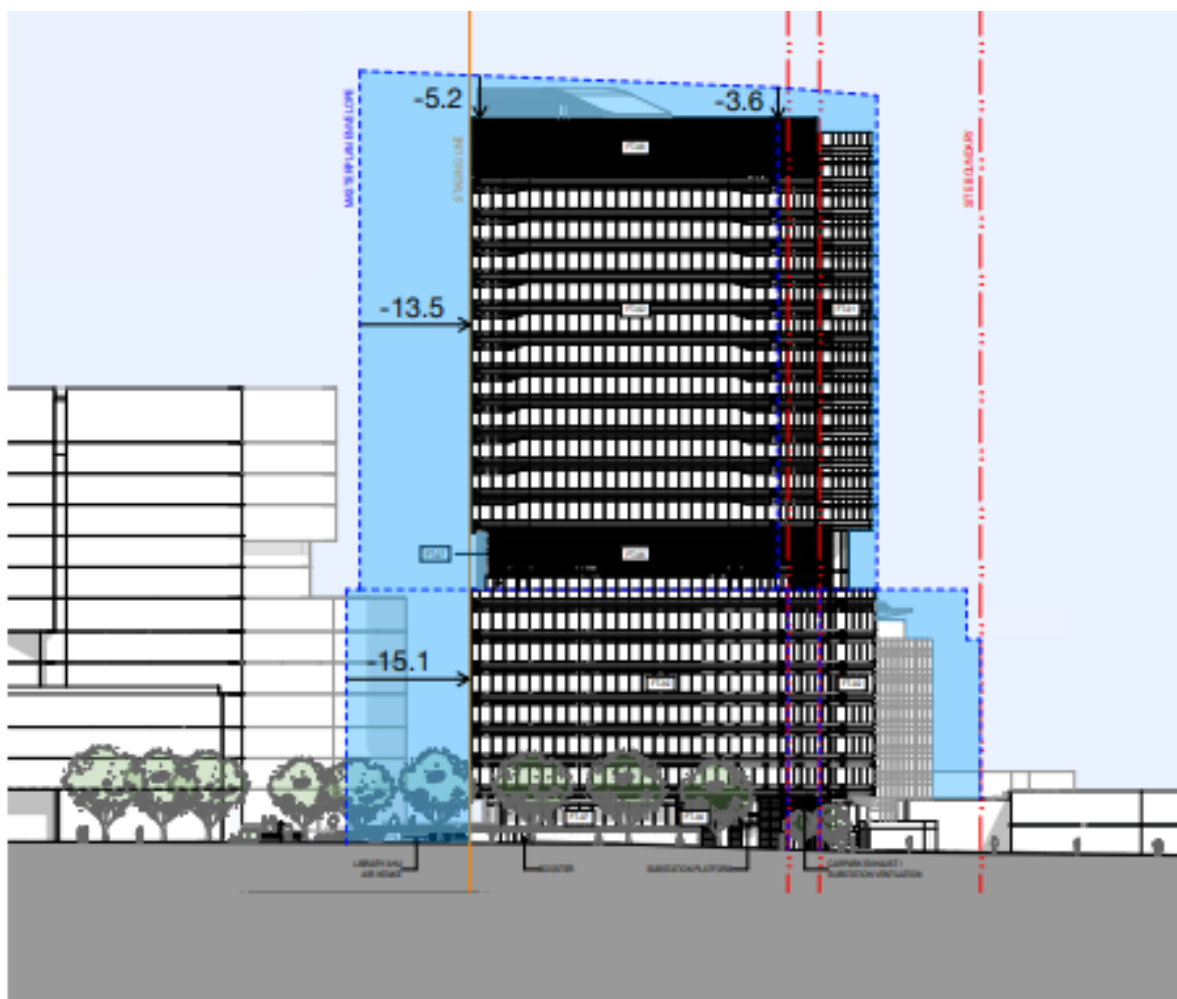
Envelope comparison elevation (Concept DA building envelope identified in light blue colour)
